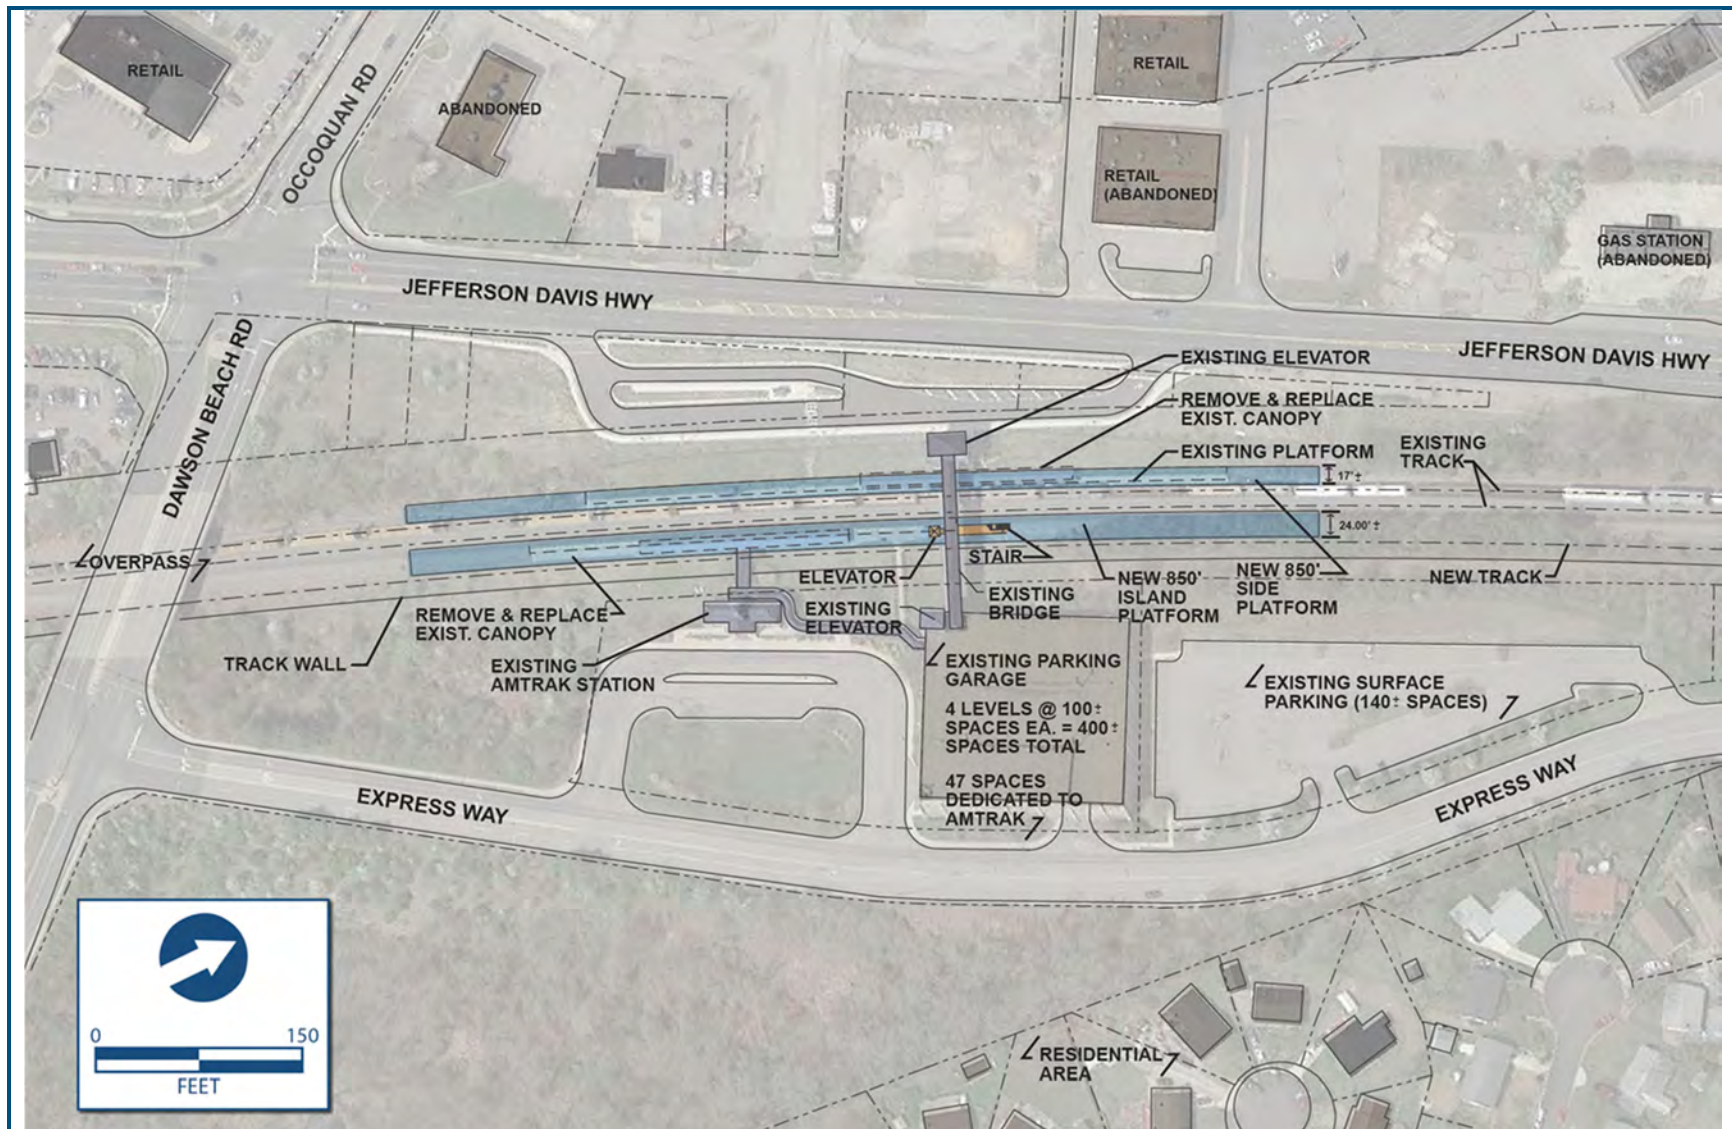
Woodbridge Station Improvements for Build Alternative 2A
